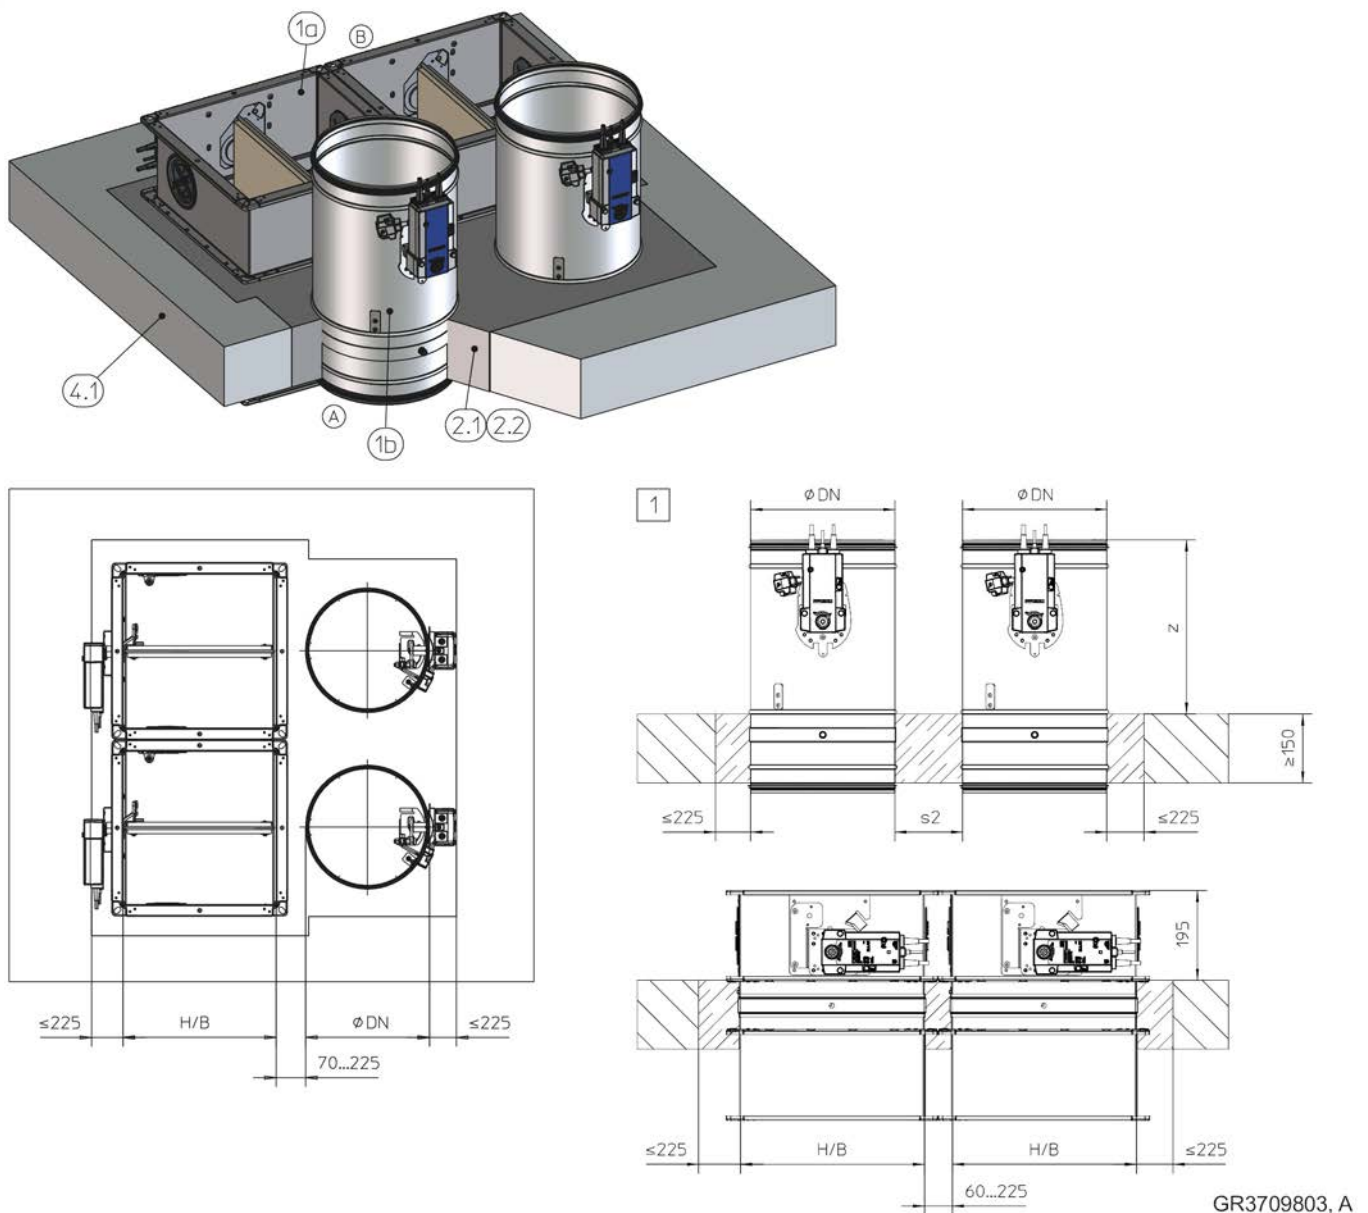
Mortar-based installation in solid ceiling slab, combined, FKA2-EU and FKR-EU, shown upright (also applicable for suspended arrangement)
